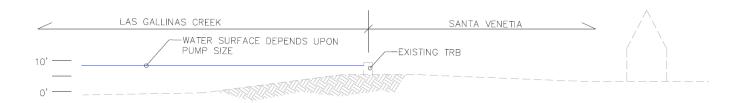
Cross Section through the South Fork of Las Gallinas Creek looking downstream
